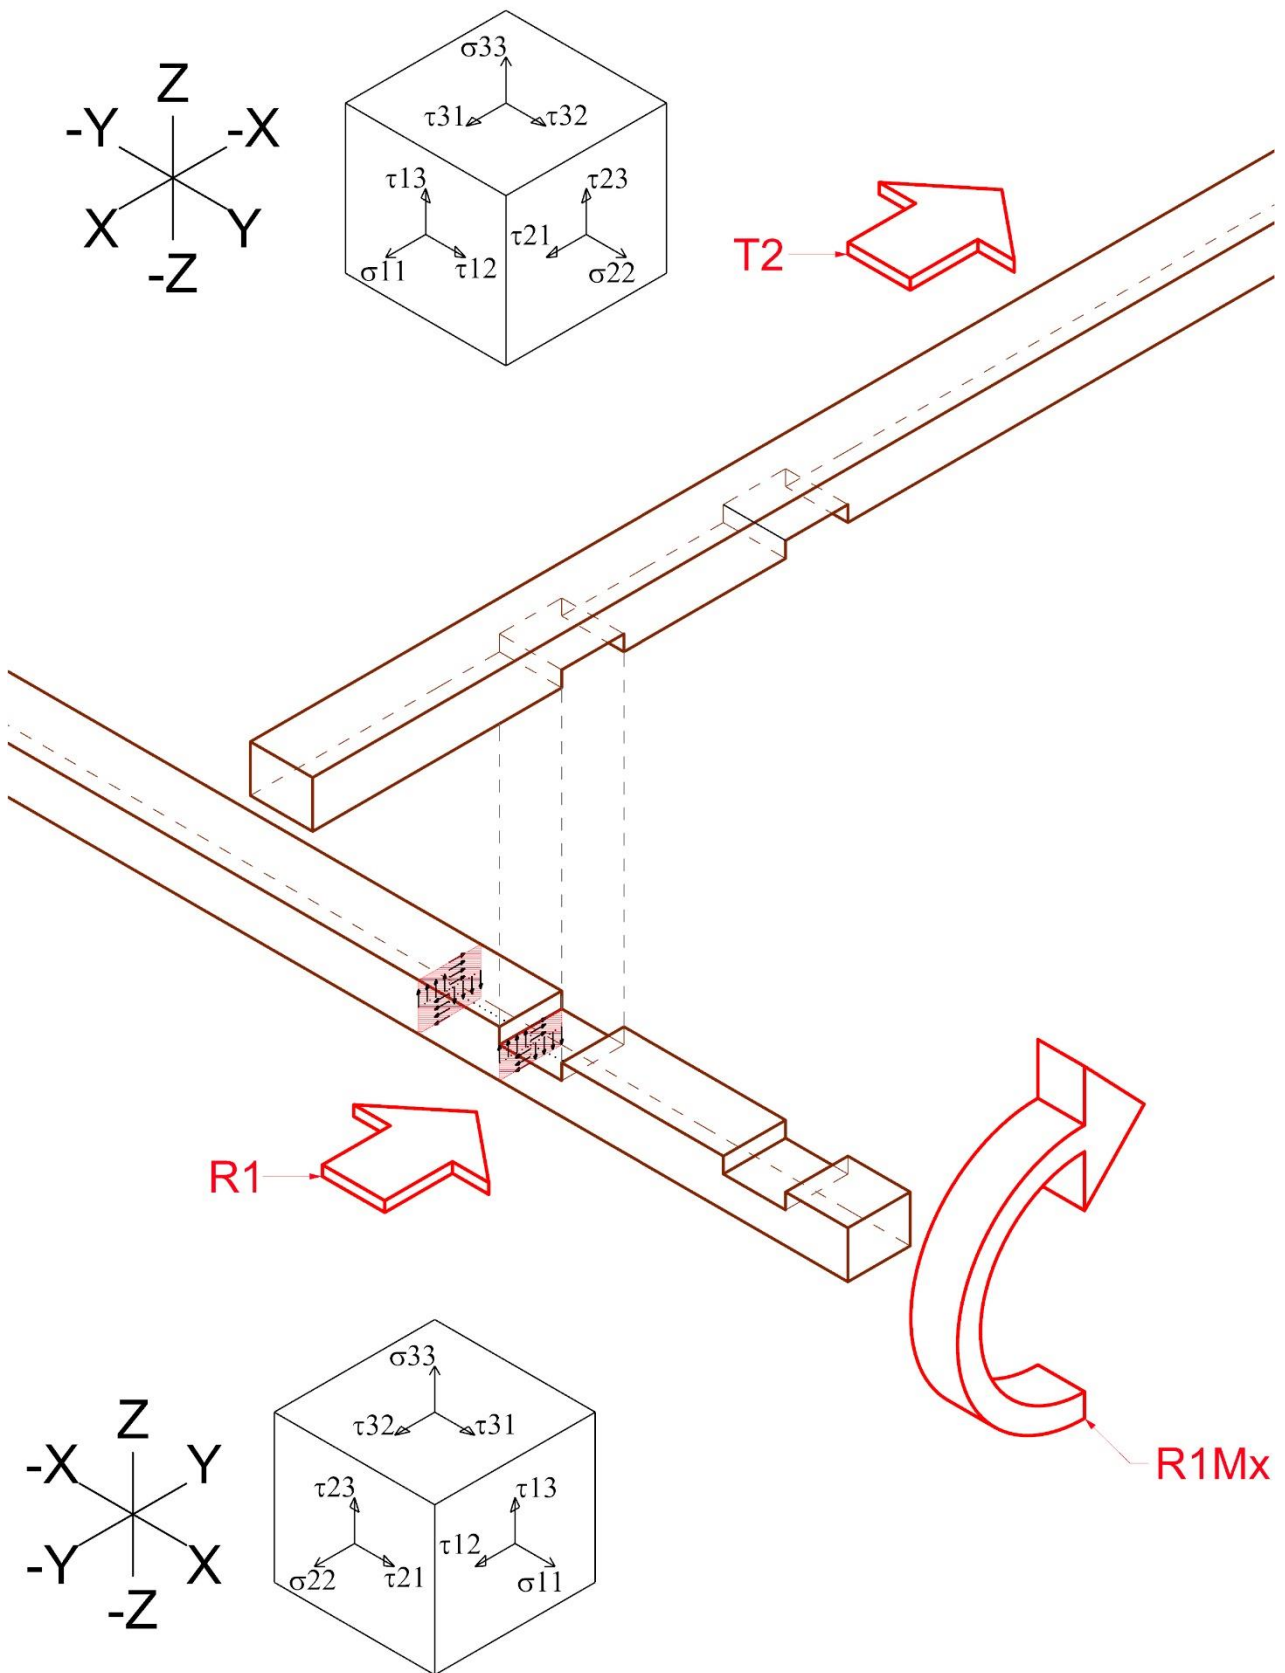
Roof Rafter Head Bending moments: Torsion: Tangential stresses: Crossing rafters T2-R1
